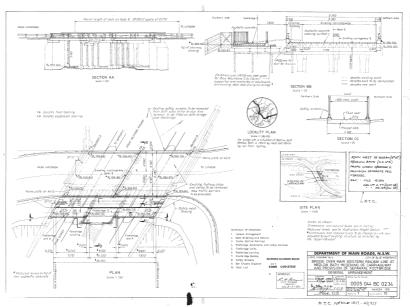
1980. Bridge over Great Western Railway line at Medlow Bath. Widening of carriageway and provision of separate footbridge.
